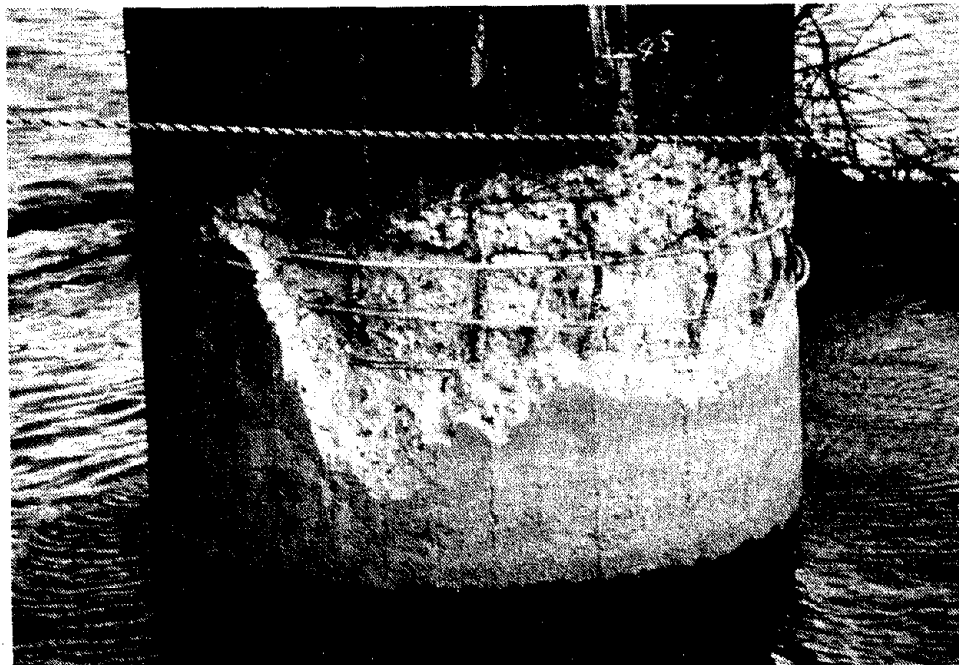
C Detail of a damaged column of the bridge over the Assabu River. Note the buckling of the vertical reinforcing steel and the wide spacing of shear (horizontal) reinforcement. The estimated damage is 25 to 50% of the value of the bridge.
